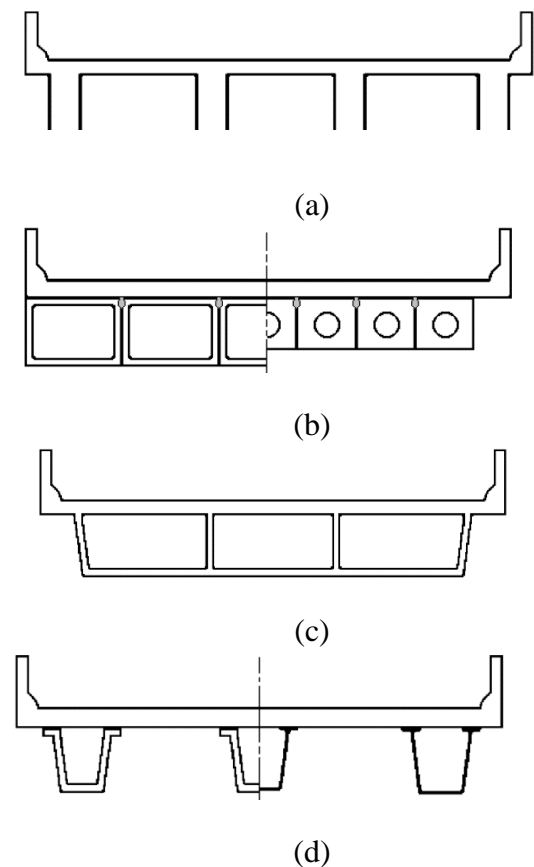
a) Cast-in-place Concrete Tee Beam b) Pre-cast Solid, Voided or Cellular Concrete Boxes with Shear Keys c) Cast-in-place Concrete multicell box d) Precast concrete Boxes with Cast-in-place concrete slab (AASHTO, 2017)
